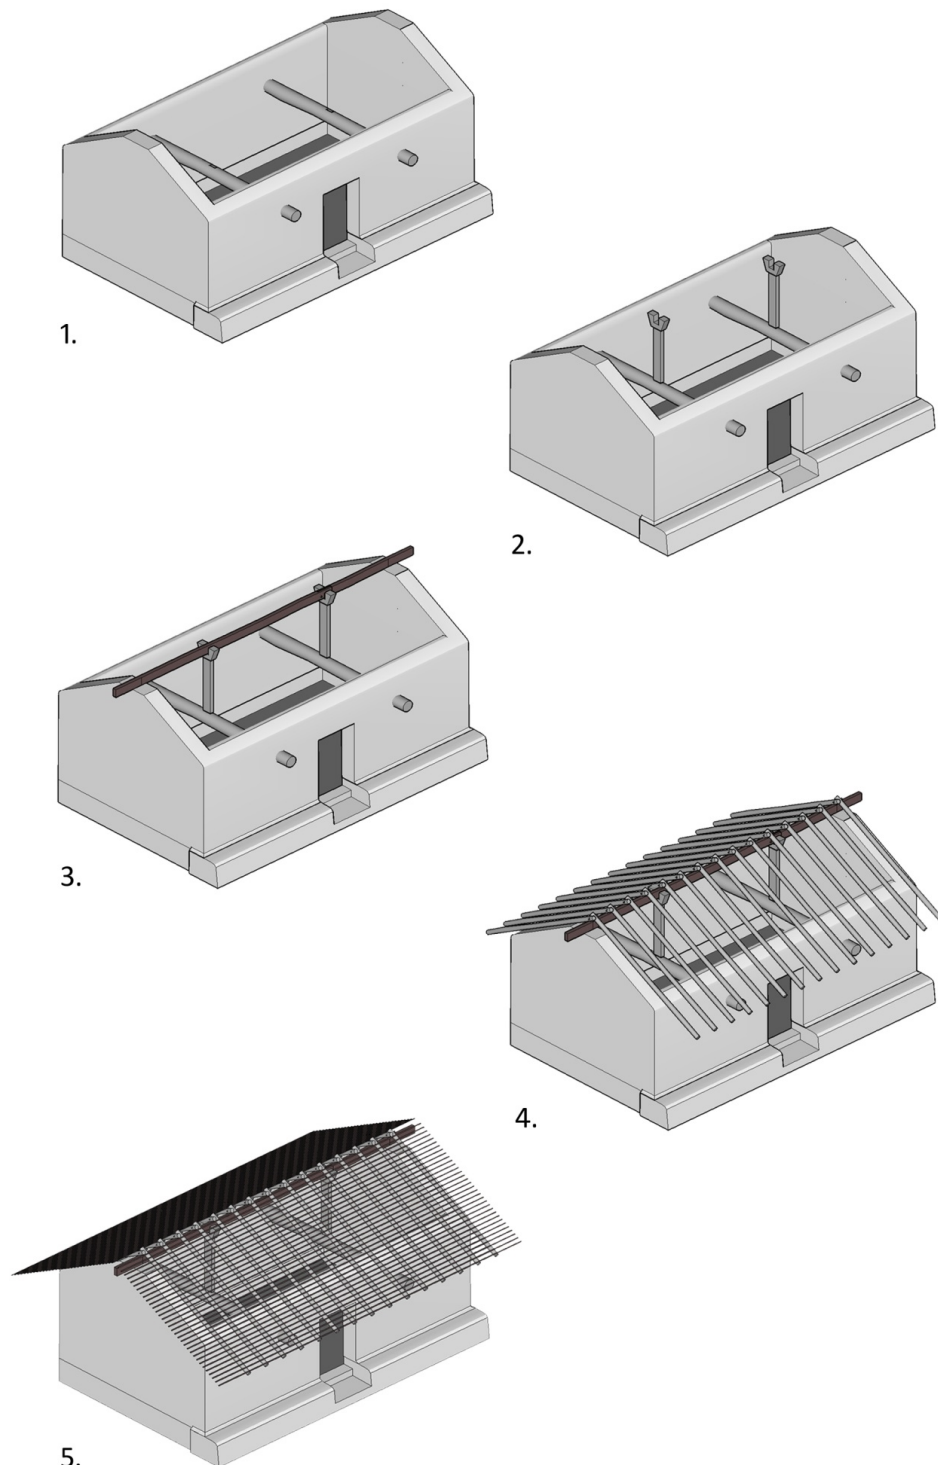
Roof structure in *orak*. From 1-5, the sequence of addition of structural members may be observed. First, central beams, followed by posts, ridge beam, rafters and batten, on which the final roofing material will be placed to complete the roof.
